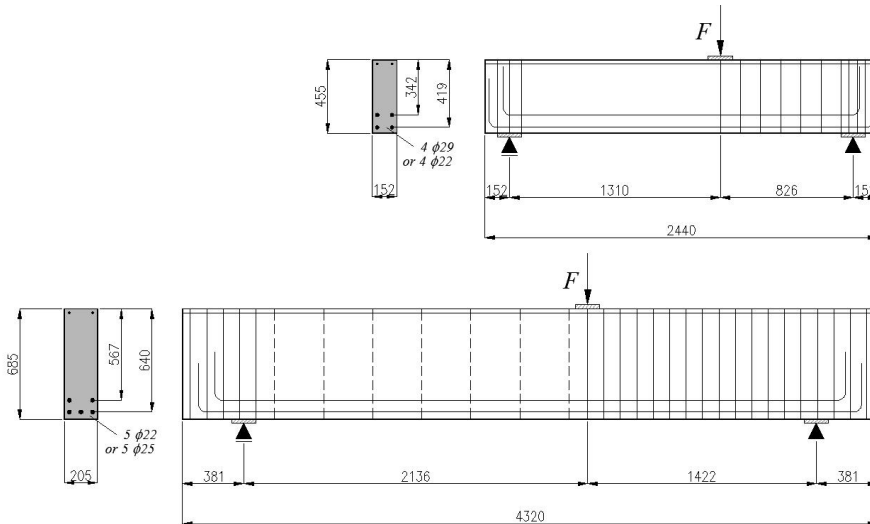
Geometry and reinforcement arrangement of the beams and loading configurations [DIN2010]
